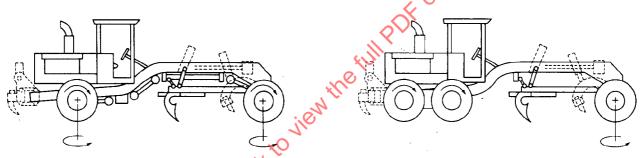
FOUR WHEEL, FRONT- AND REAR-WHEEL STEER, FIG. 6.1.3—SIX WHEEL, FRONT-WHEEL STEER, FOUR-WHEEL DRIVE
